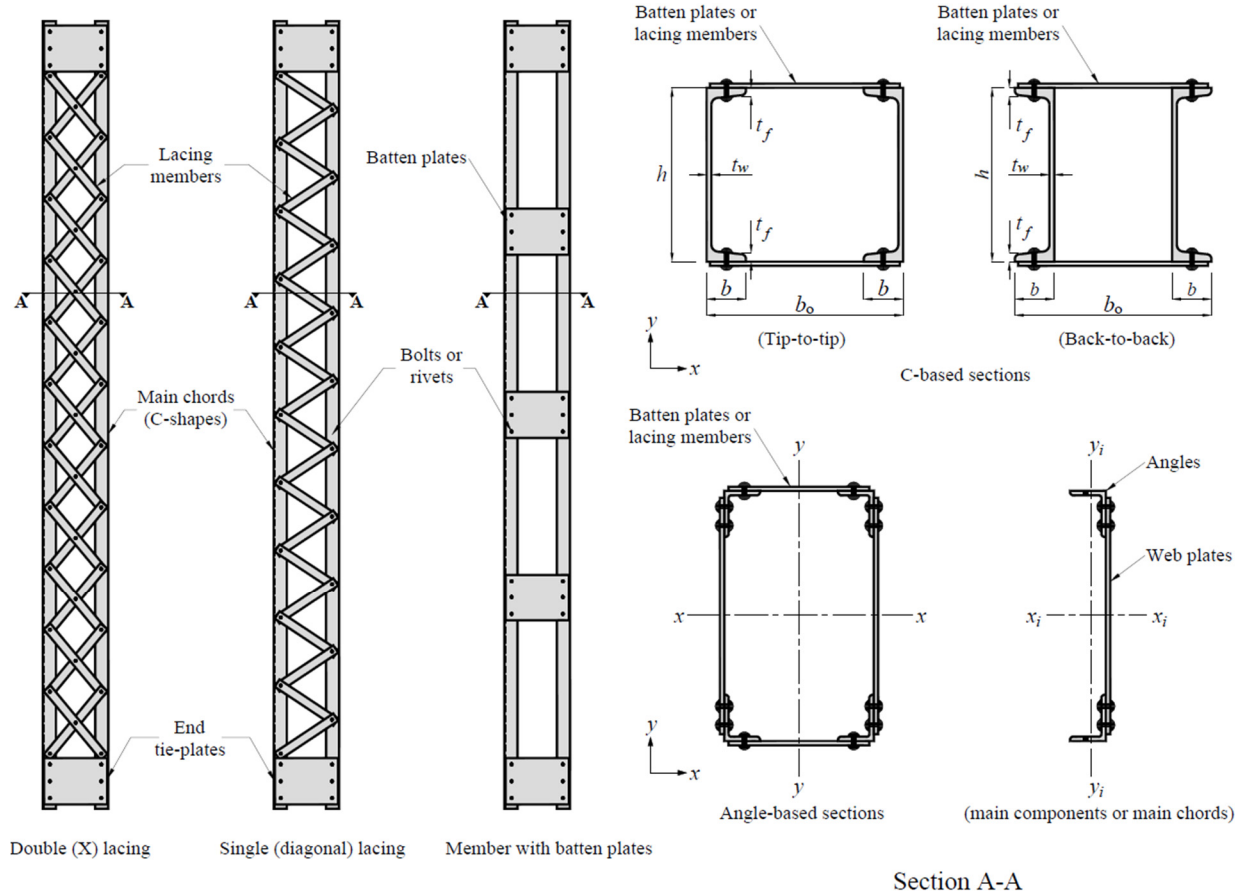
Notations and typical built-up members are commonly used in steel truss bridges.
